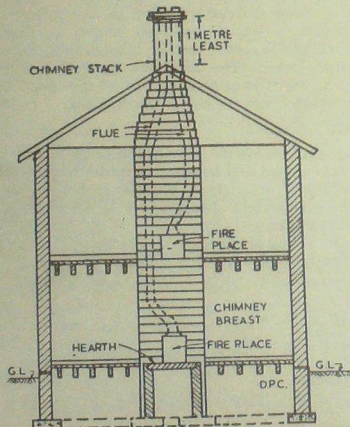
Elevation of a typical arrangement of fire-places of a building on different floors.
